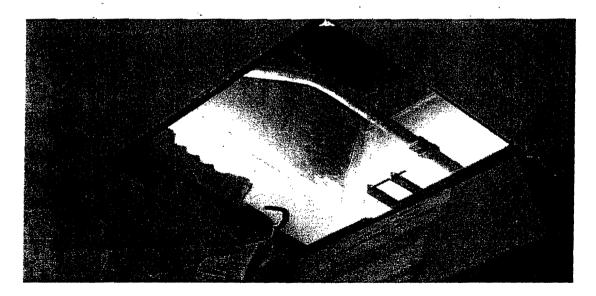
8TS6 12" by 12" Access Panel Above Ceiling.
